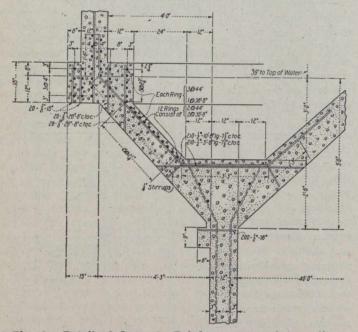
Detail of Concrete Reinforcement at Intersections of Outer Dome, with Inner Dome and Tank Wall.
